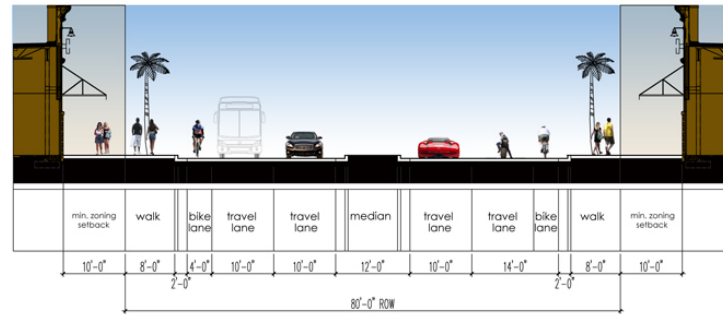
Typical Cross Section – Segment 4 (Ridgewood Avenue to Beach Street)
